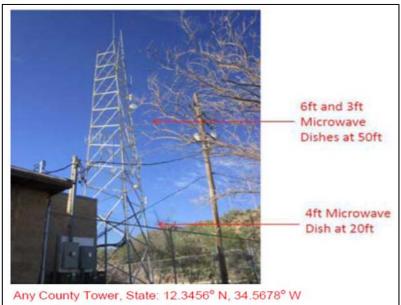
Ground-level photograph showing proposed locations of new communications equipment on an existing tower.
